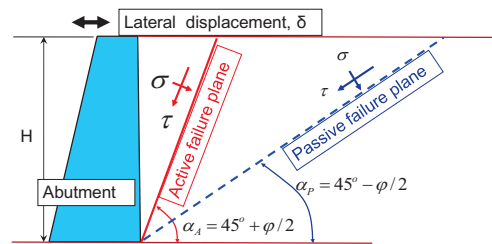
Active and passive failure planes in the backfill behind an abutment with vertical smooth face and a horizontal backfill crest (Tatsuoka et al., 2009; 2010).
